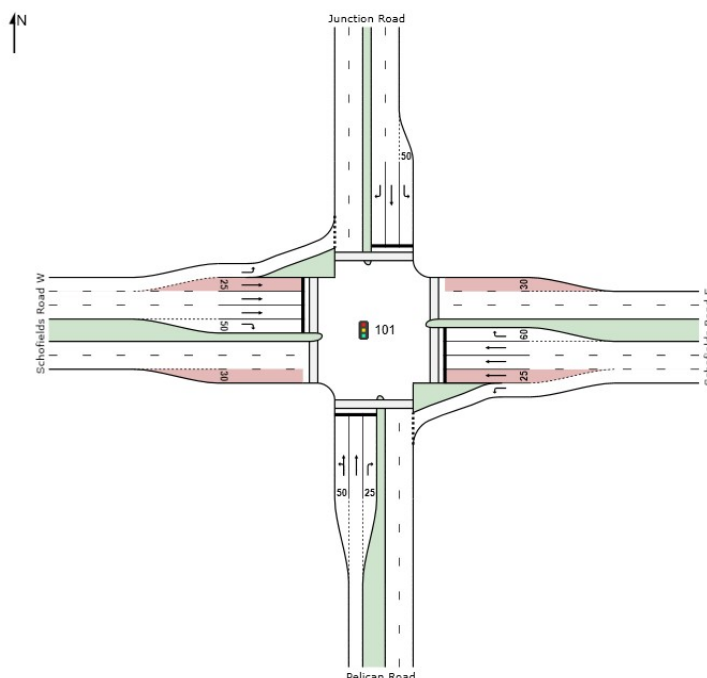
Schofields Road / Junction Road / Pelican Road Intersection Layout
